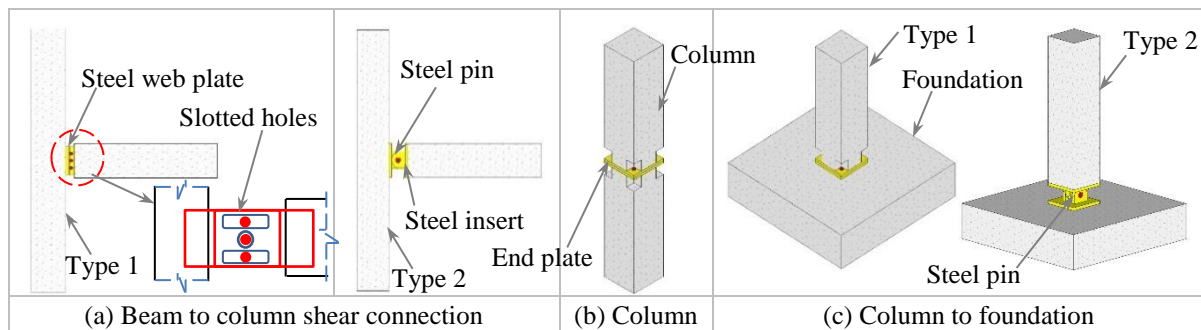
Removable beam to column pin, column to column and column to foundation connections
